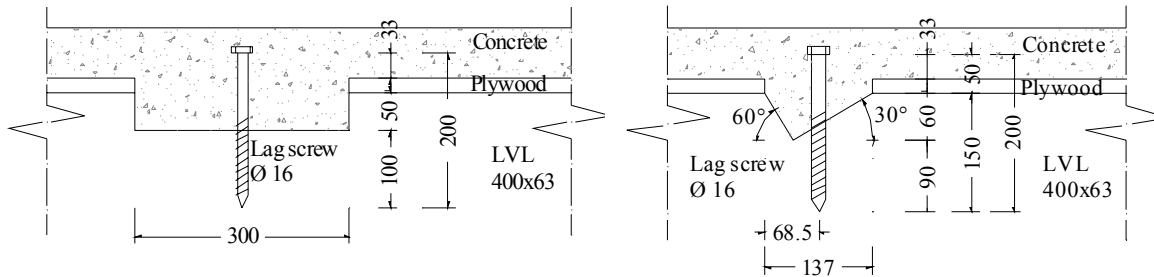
Details of the rectangular (left) and triangular (right) notched connections tested at the University of Canterbury (dimensions in mm) [7,18]
